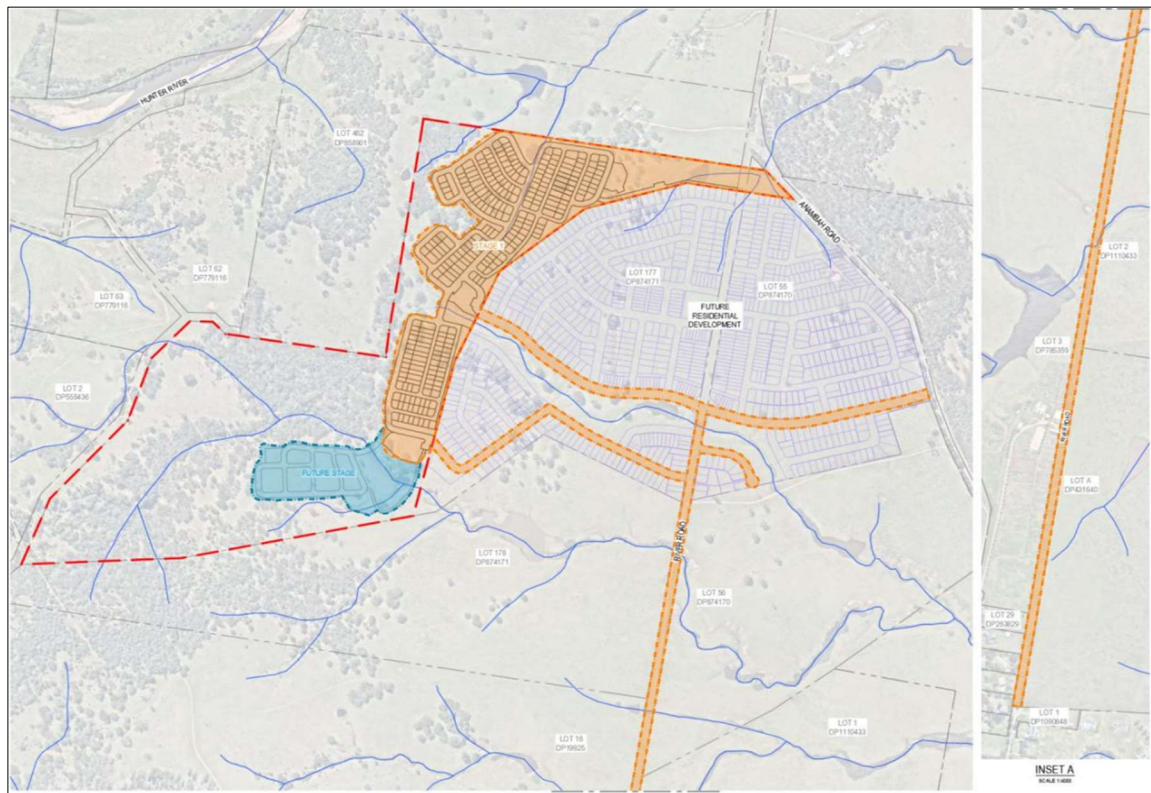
Excerpt from Staging Plan. Source: MakerEng (2024)
